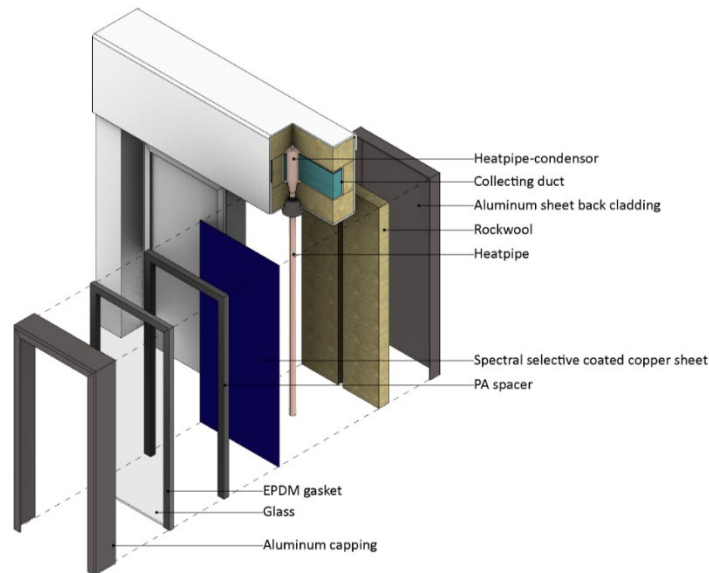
Exploded view of solar thermal louvre assembly (©Priedemann)
